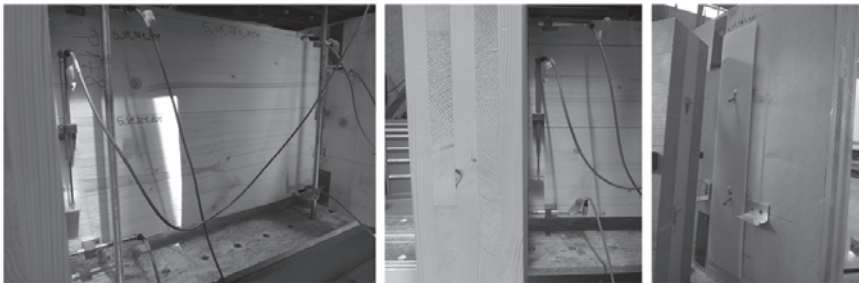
test configuration applied for shear loaded fully threaded screws in a wall-to-floor joint (internal designation S_V1_T61)
